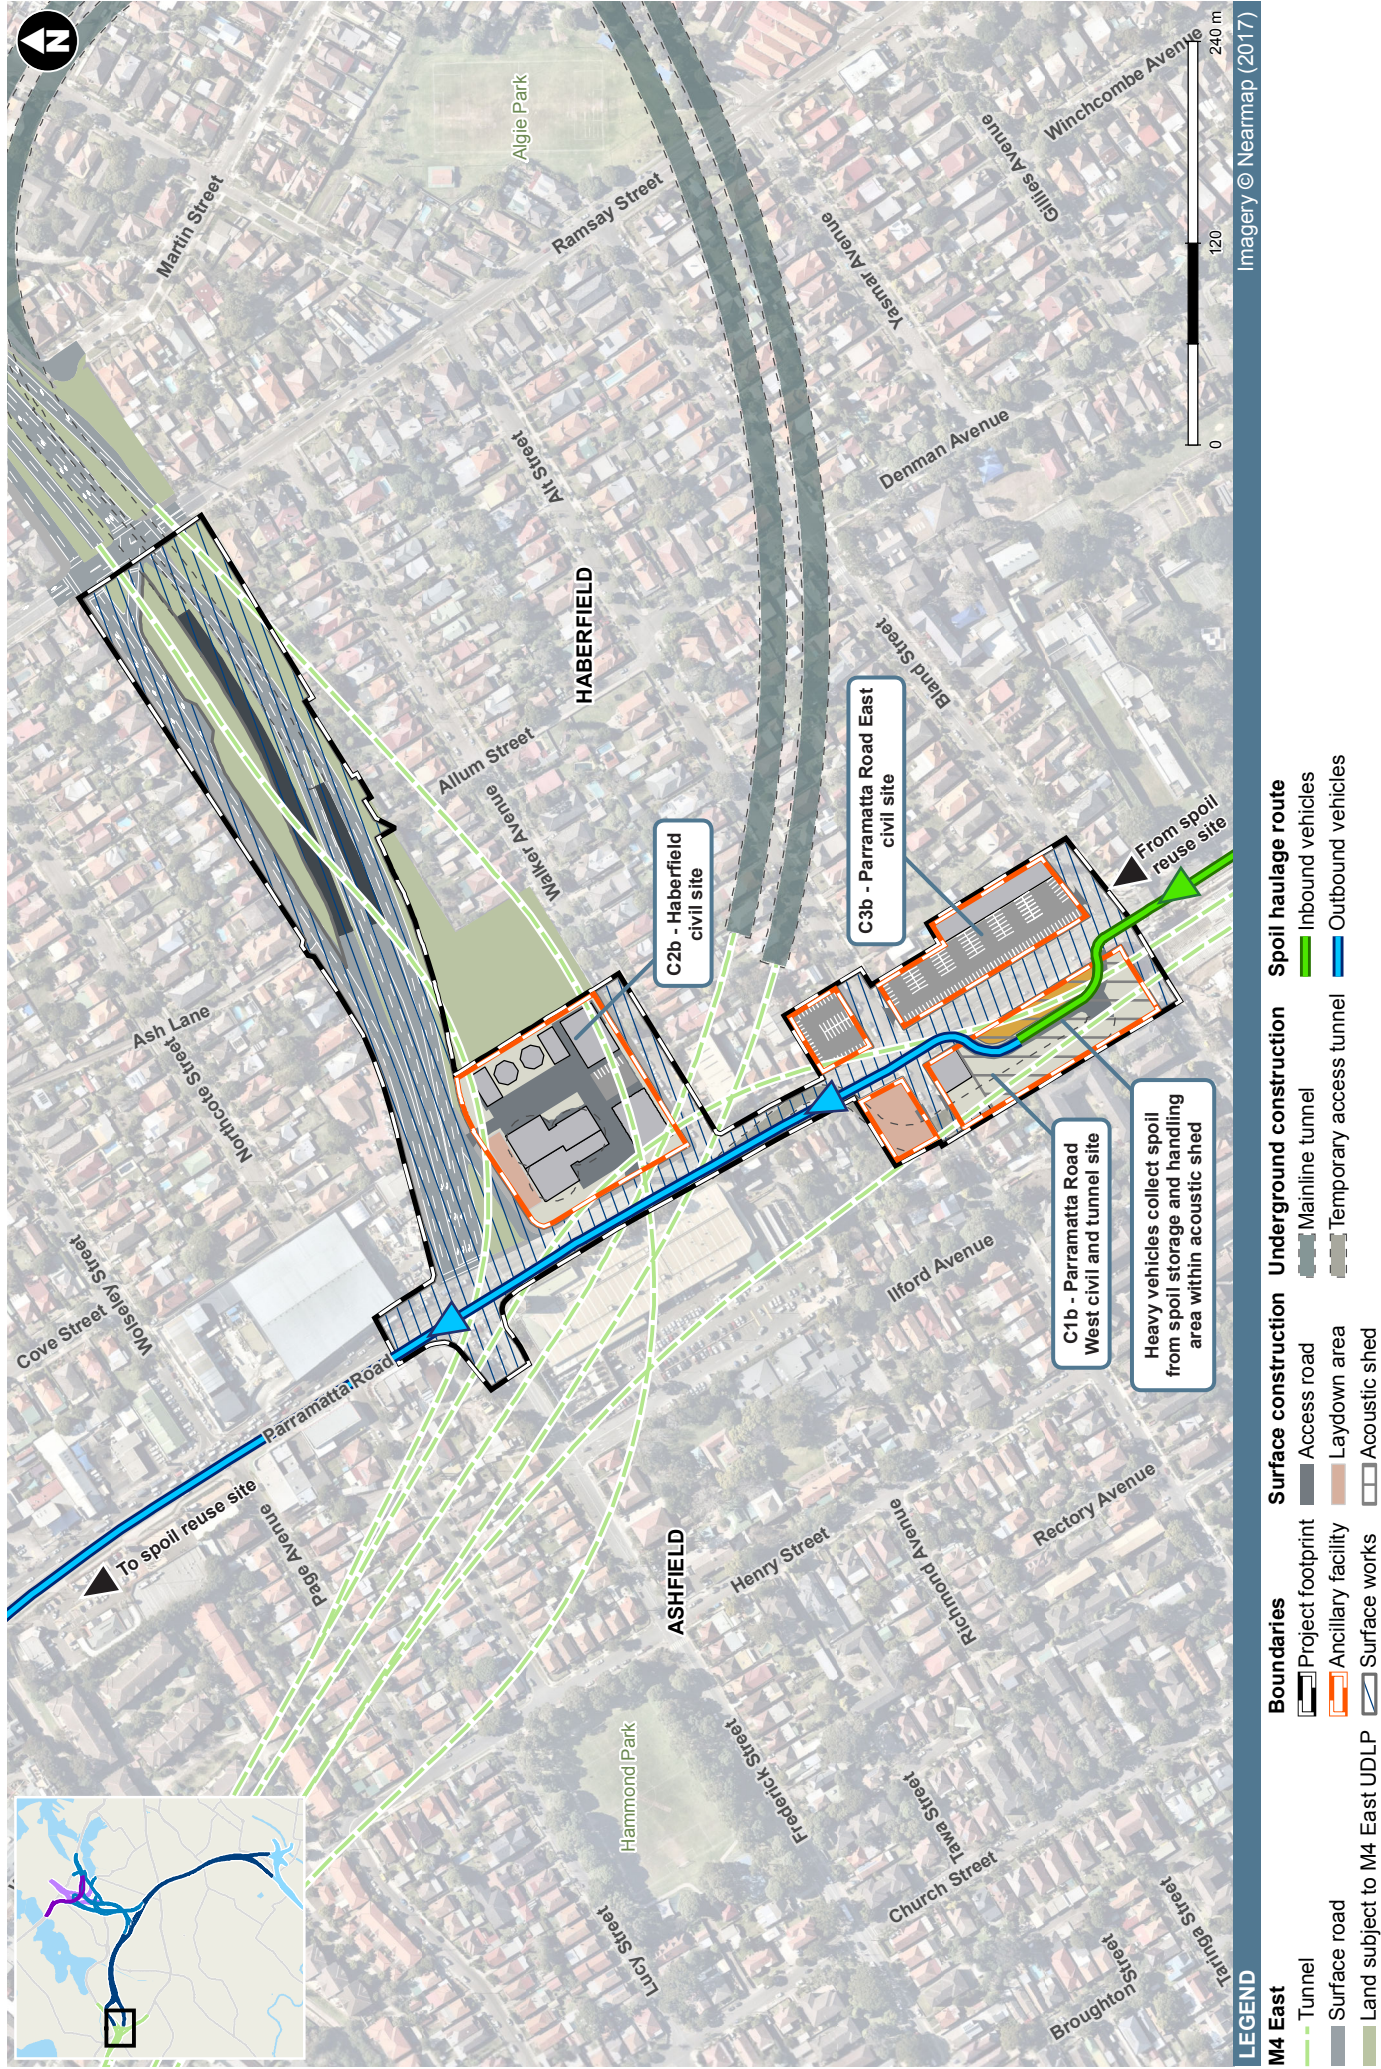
Indicative spoil haulage route – Parramatta Road West civil and tunnel site (C1b)
